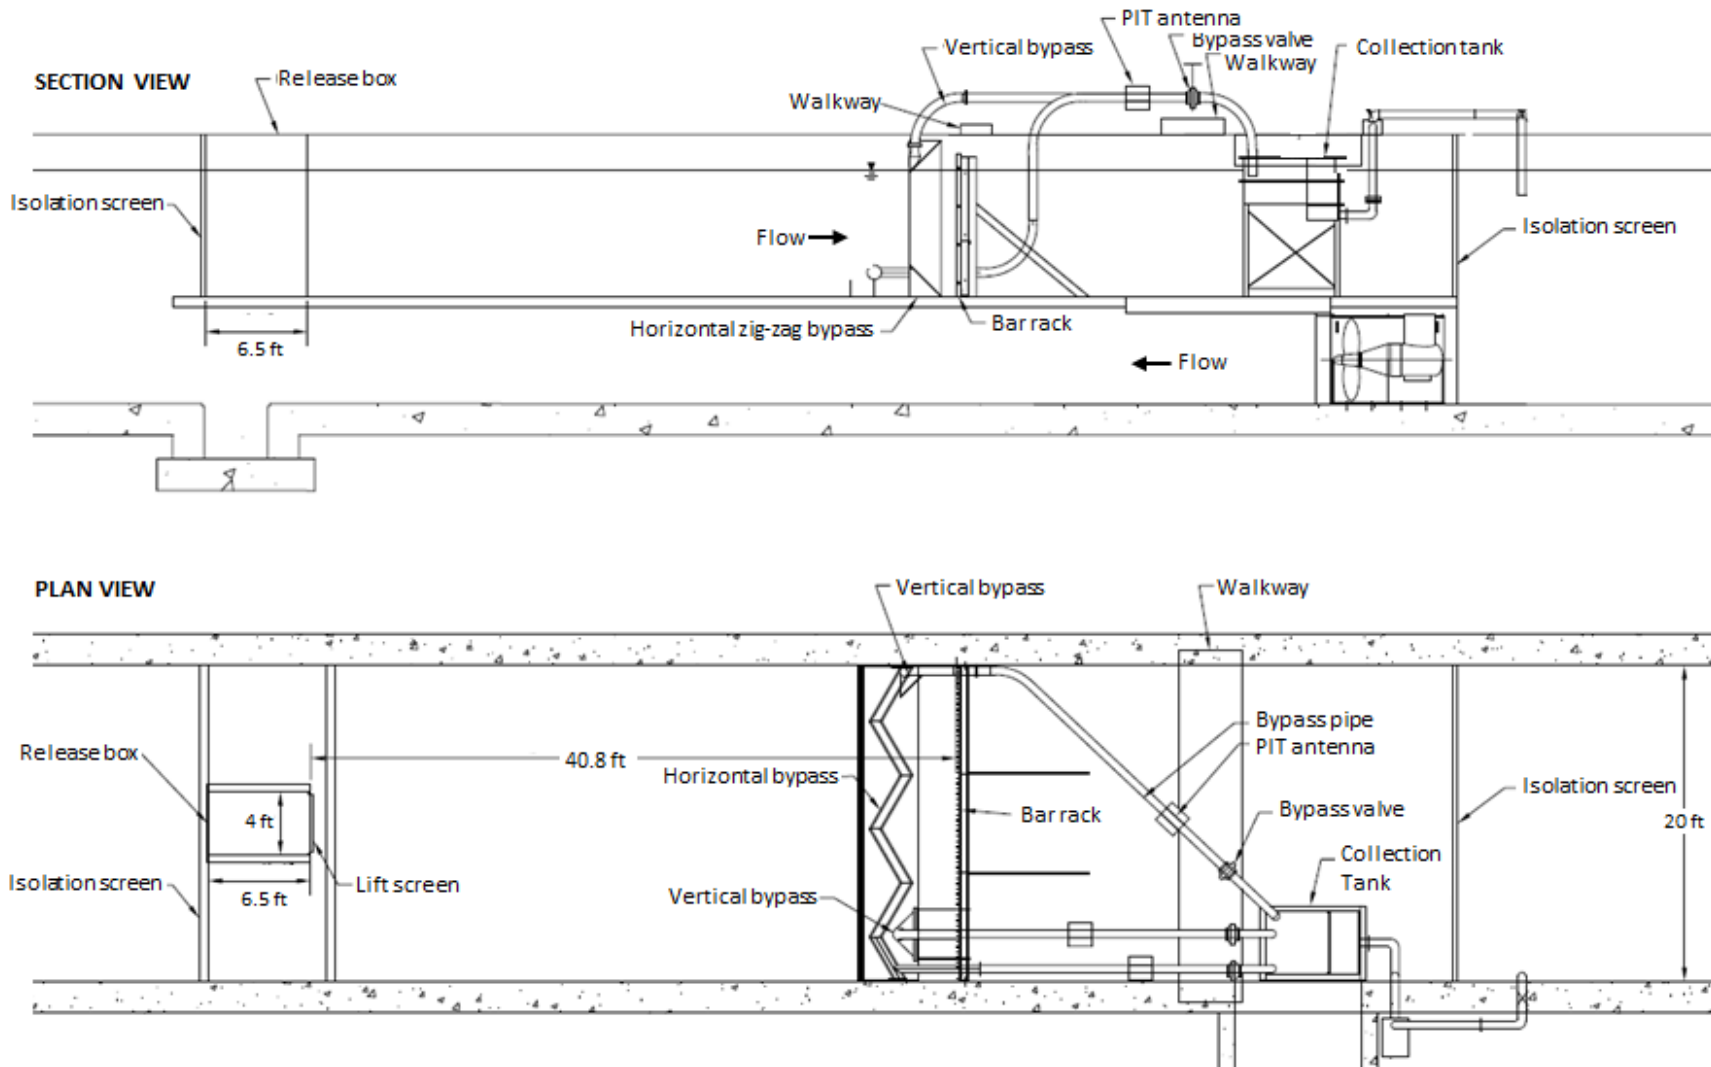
Test Facility design for the laboratory evaluation of two downstream eel bypass systems.
